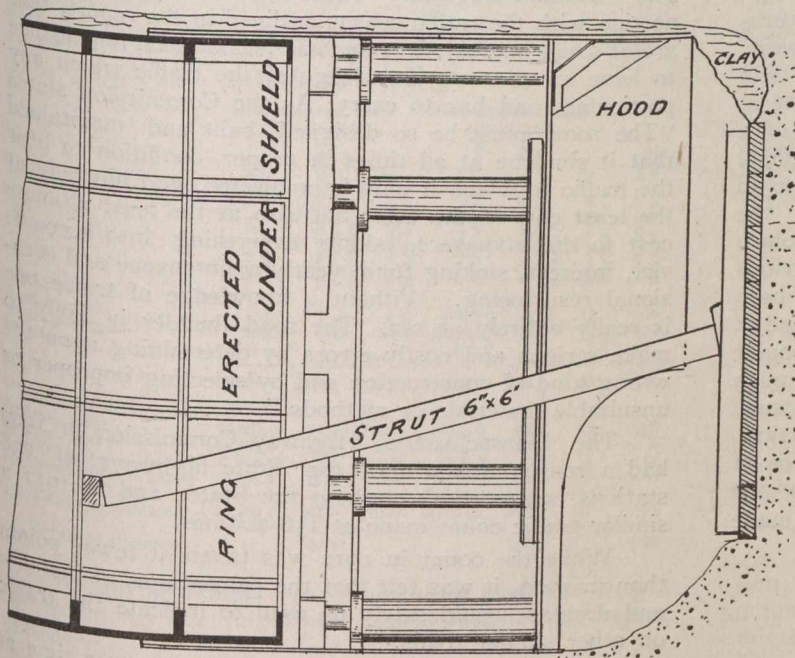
Longitudinal Section of Shield—Excavation Completed.
